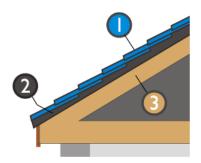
Photovoltaic Tile Installation (Horizon Renewables, 2013)
